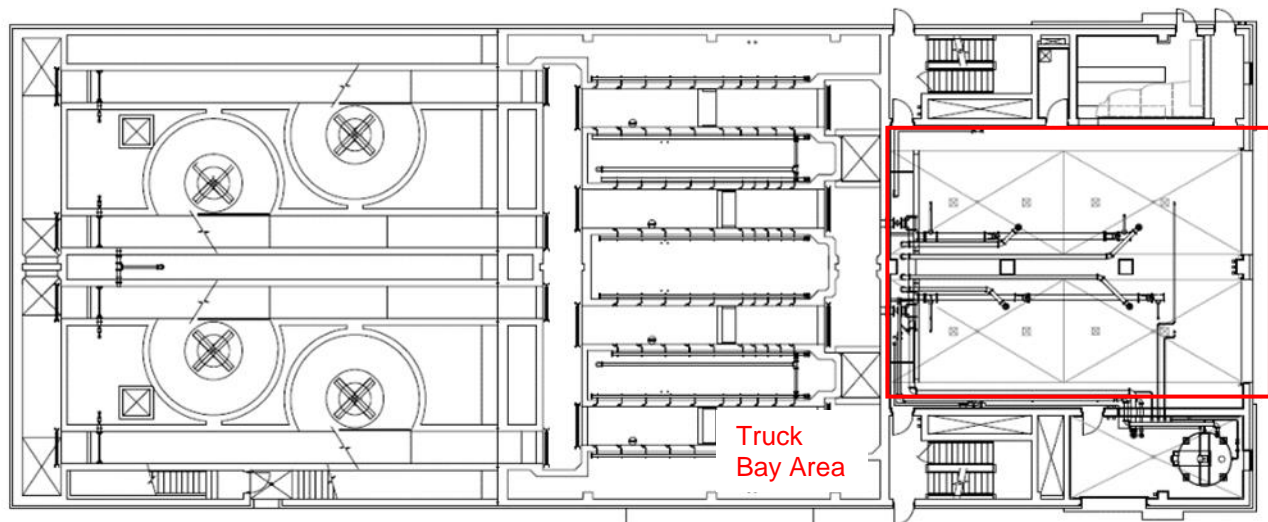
Existing Building K Plan with Truck Bay Area Highlighted
